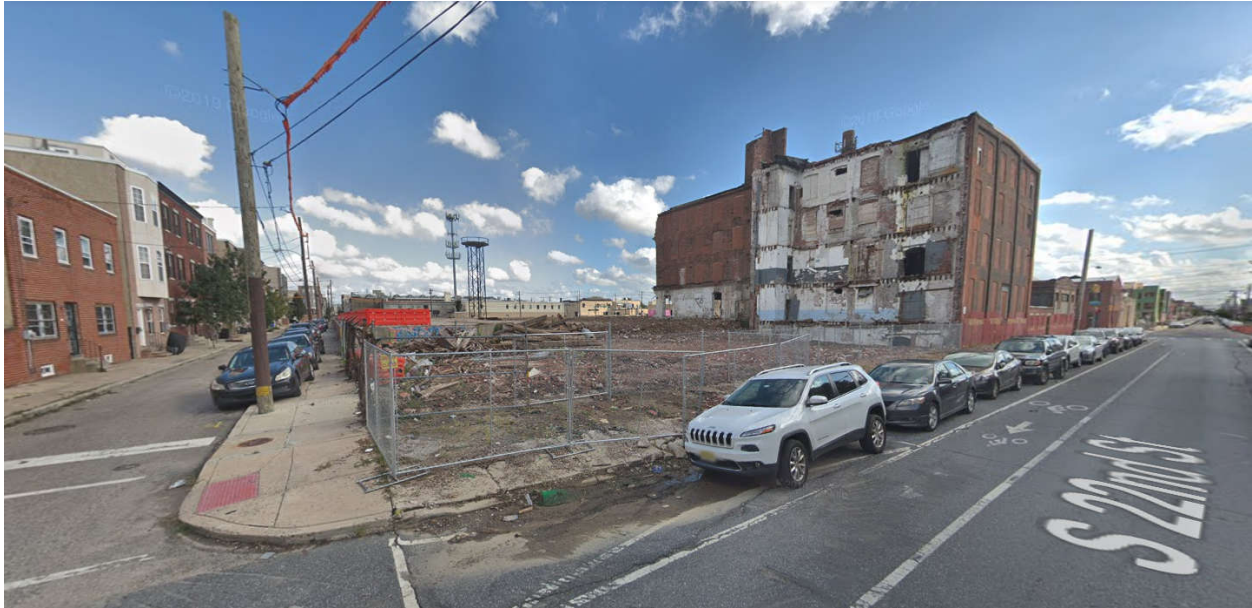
Looking to the southeast at the site from the corner of 22nd and Kimball Streets, September 2018.
